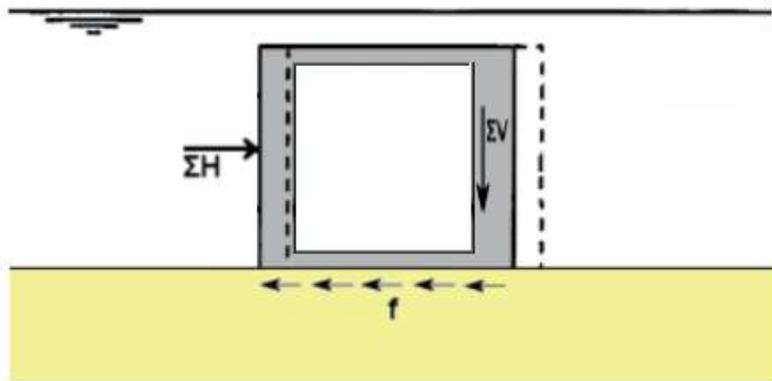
Principle of horizontal stability for submerged placement and tide (Manual Hydraulic Structures, 2019)
